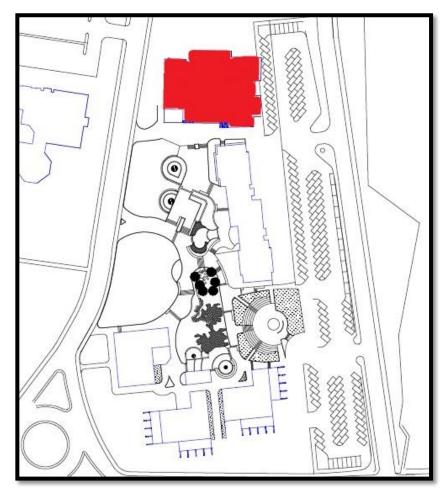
Position of Colored Building in site plan of Architecture Faculty
